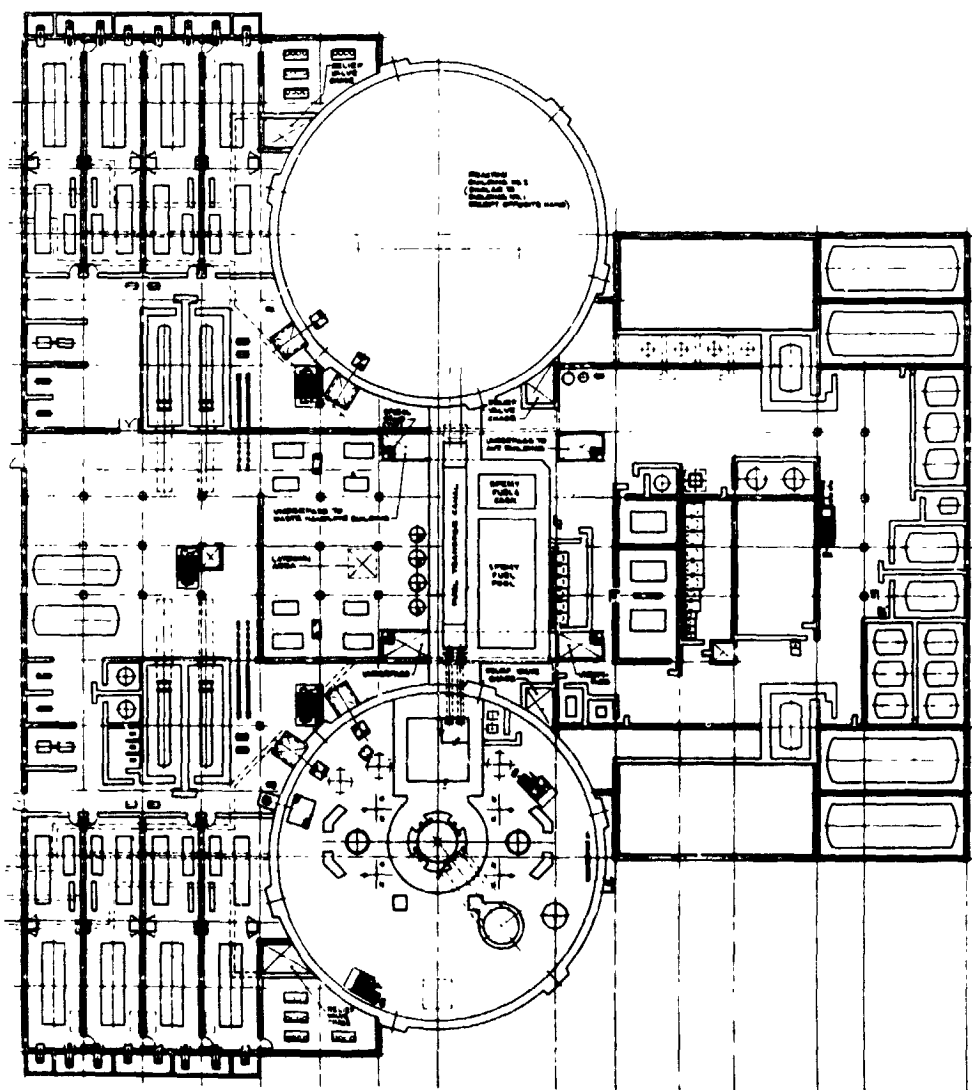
Plan of typical pressurized water nuclear power plant structure.
